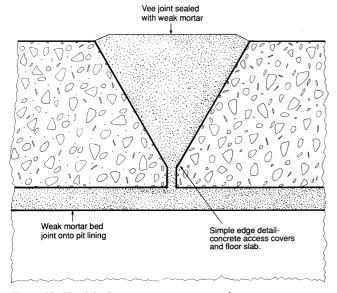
Vee joint between access covers and floor slabs of a pit latrine
